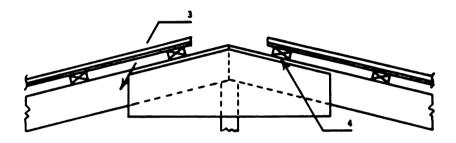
Location of test sites, Barn I. Truss No. 2, 31.6m (104') from north end. South elevation. Flashing not shown
